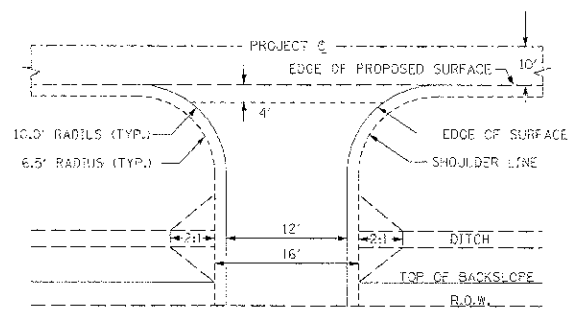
DETAIL OF INTERSECTION 67+66.8 LT AND RT
